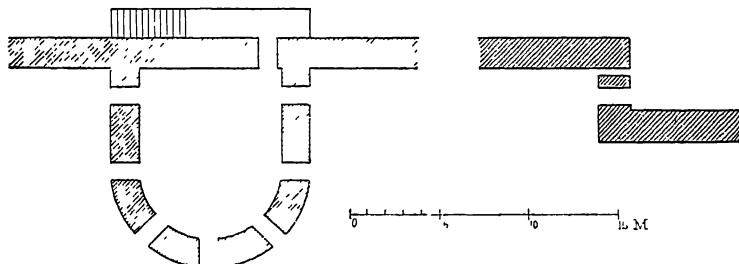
Leleges' Wall. Plan of tower and adjacent rampart. TÉXIER, *Description*, Plate CXLVII.
